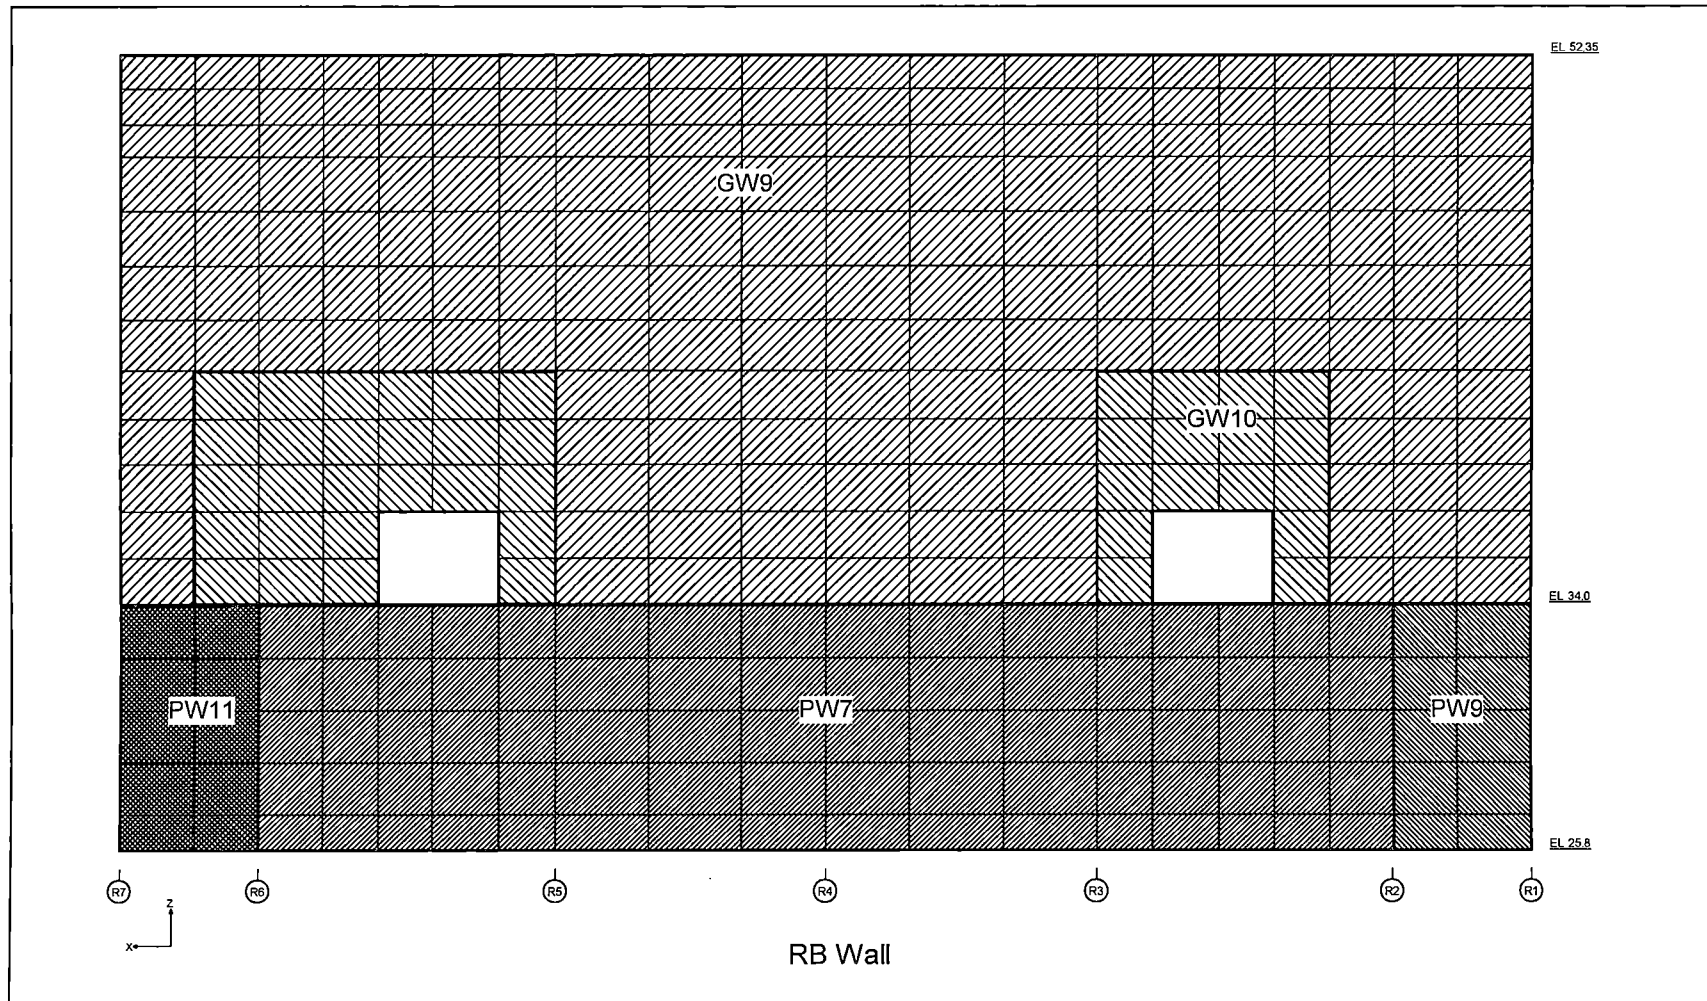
Application of Thermal Load on the External Wall (RB)
